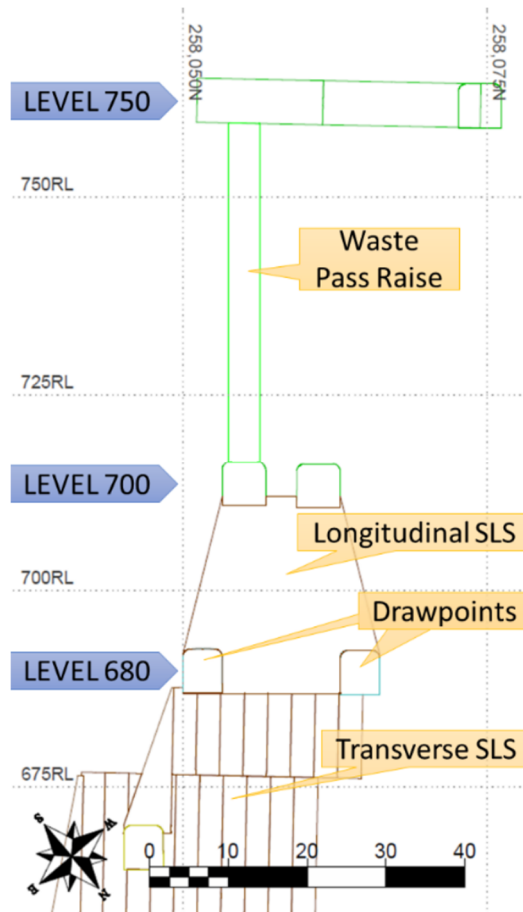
Cross section showing the waste rock pass, upper longitudinal SLS and lower transverse SLS.
